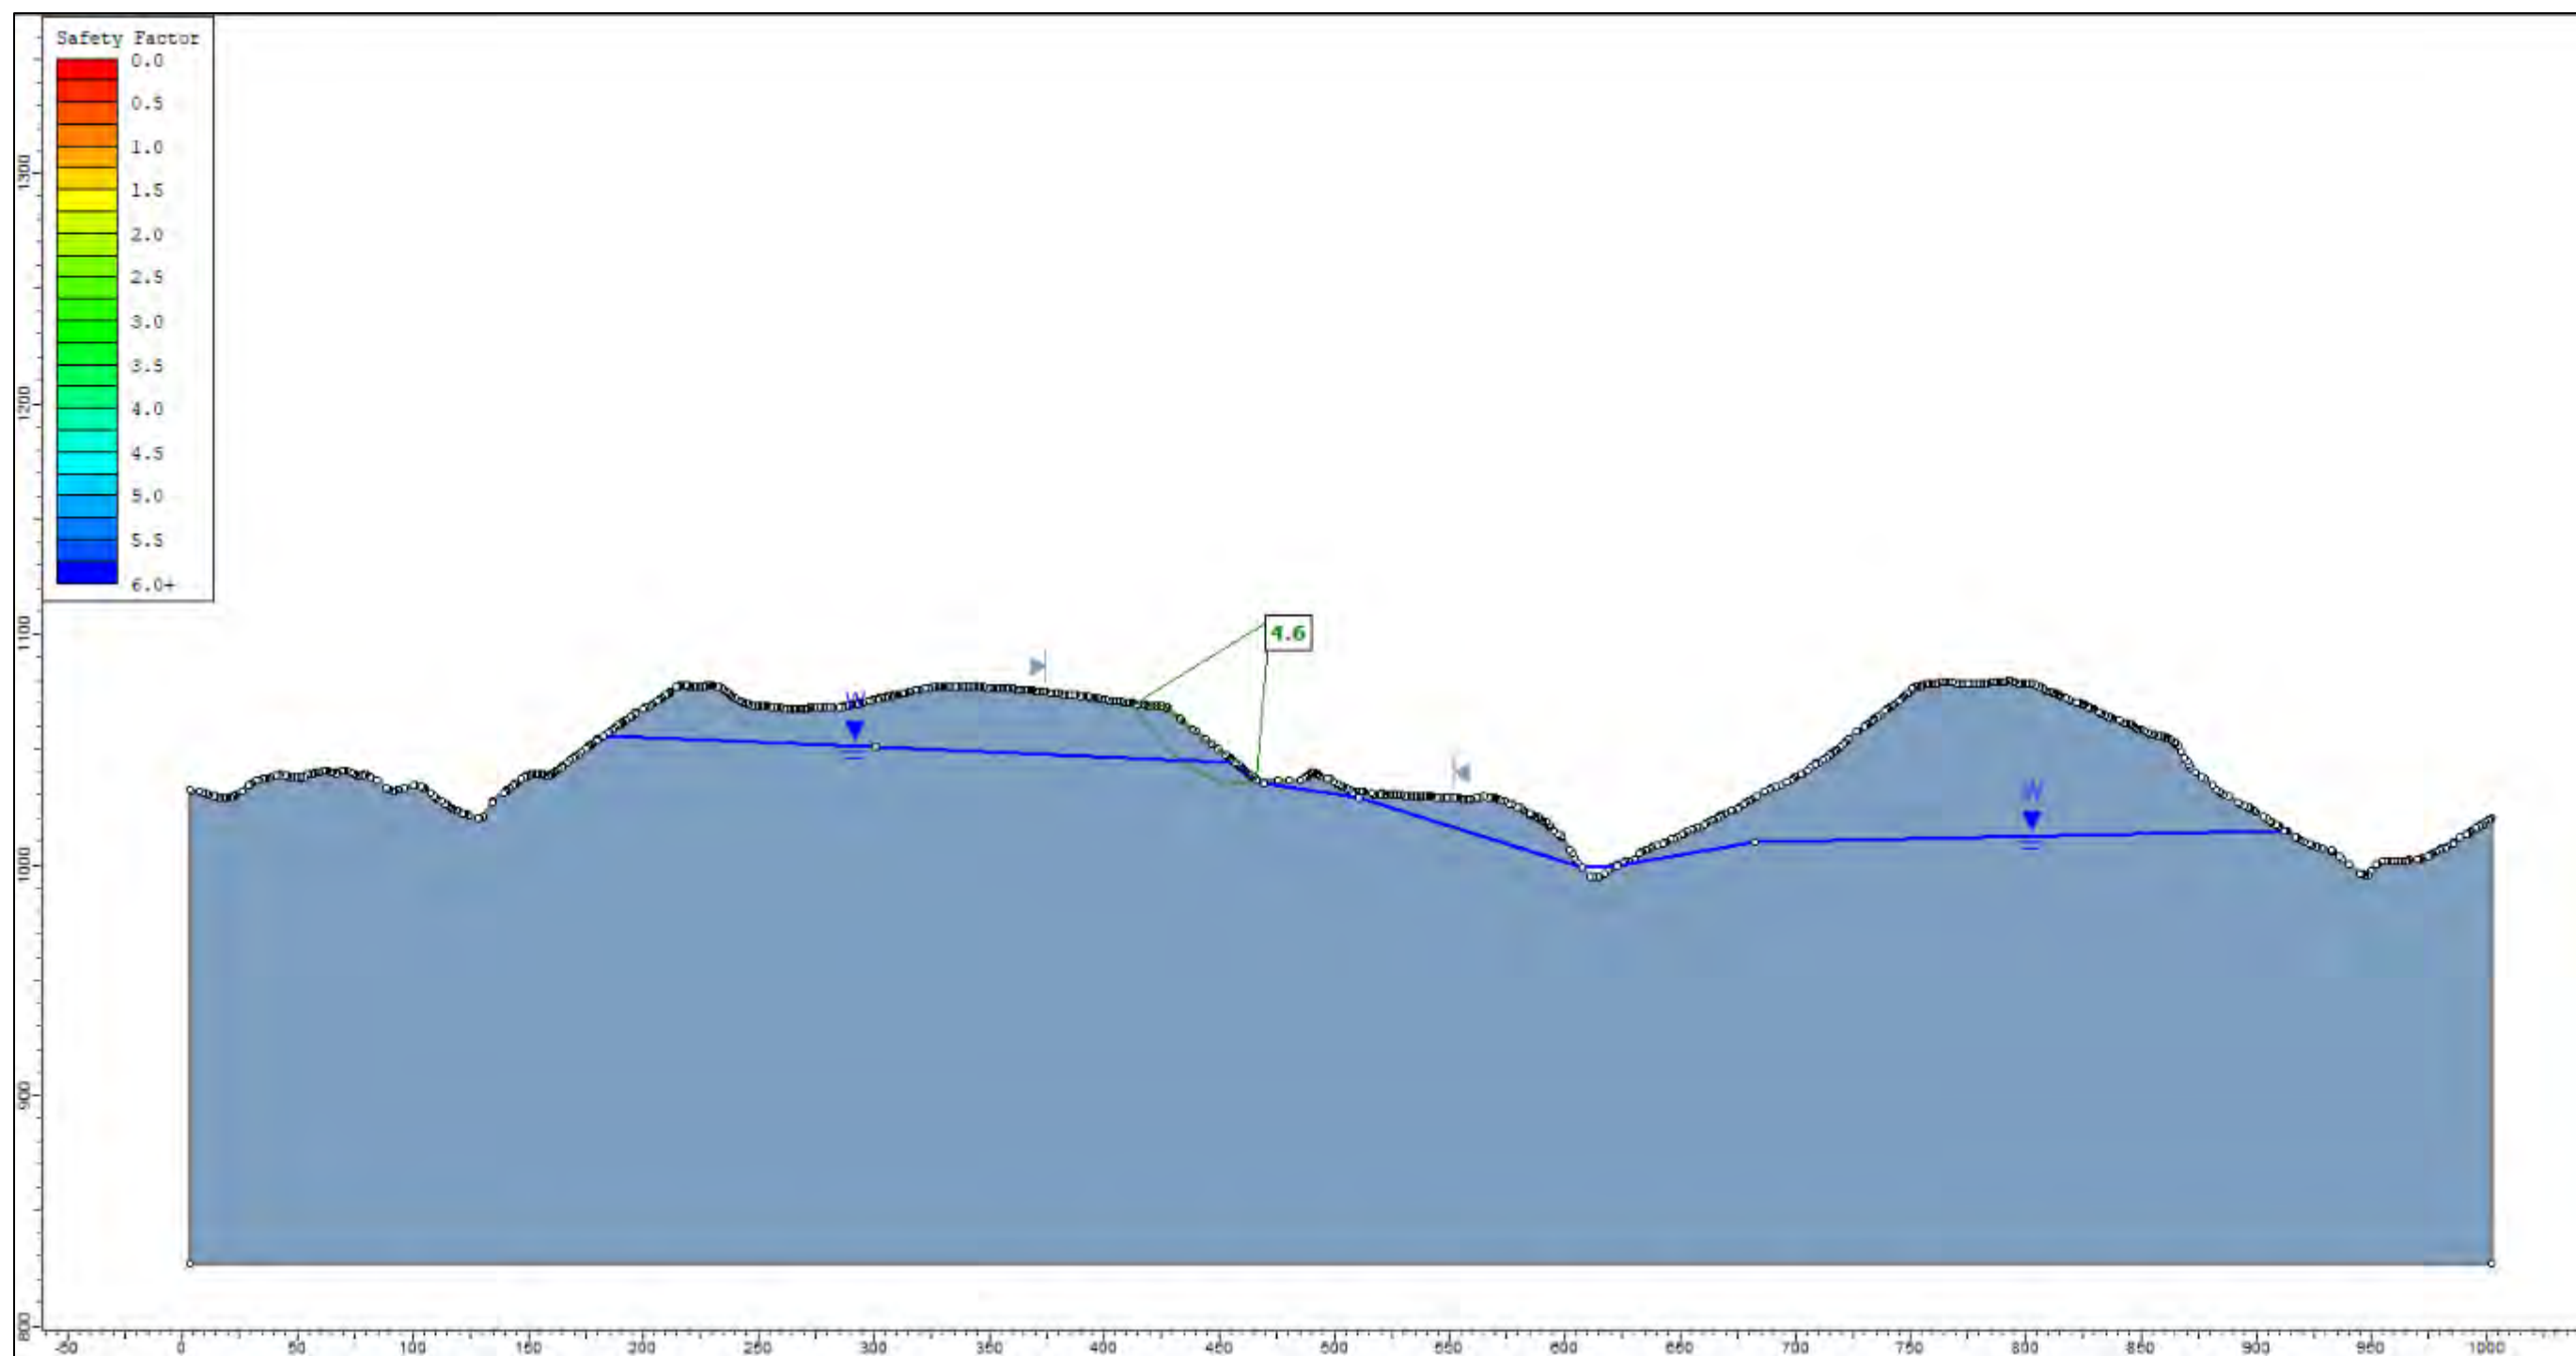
Haul Road Cut - Section 110 – Elevated Groundwater Conditions.
